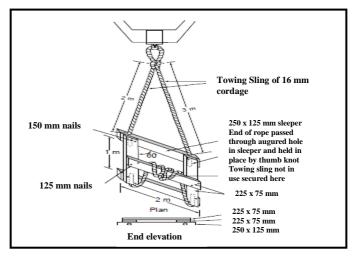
(a): Improvised Drag for a Single-Lane Earth Road.
